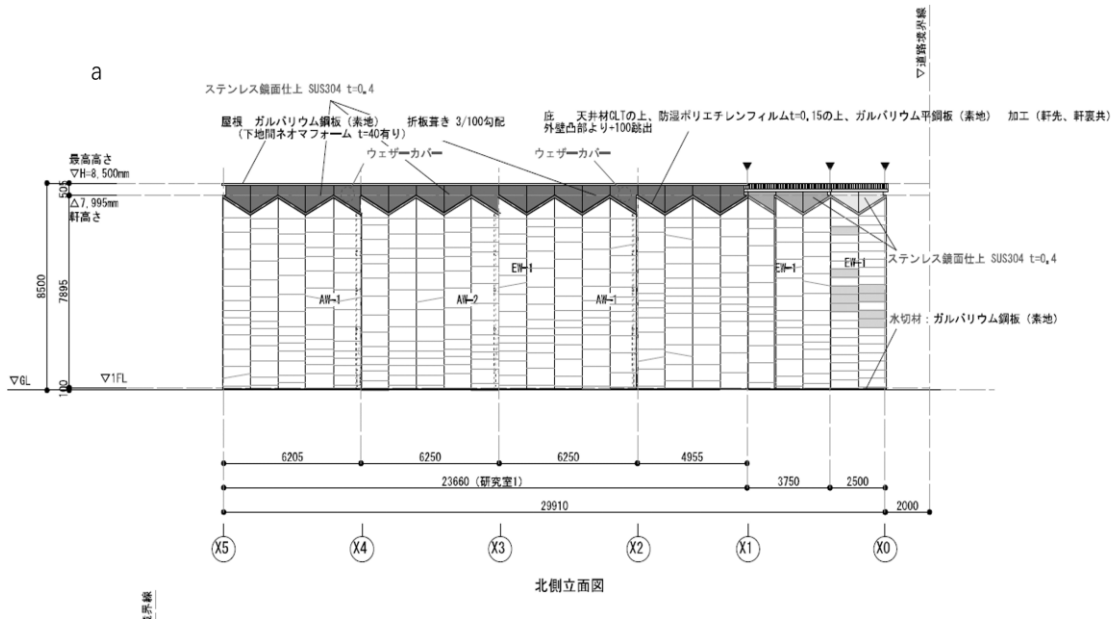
Construction drawings, taking the north elevation as an example.
